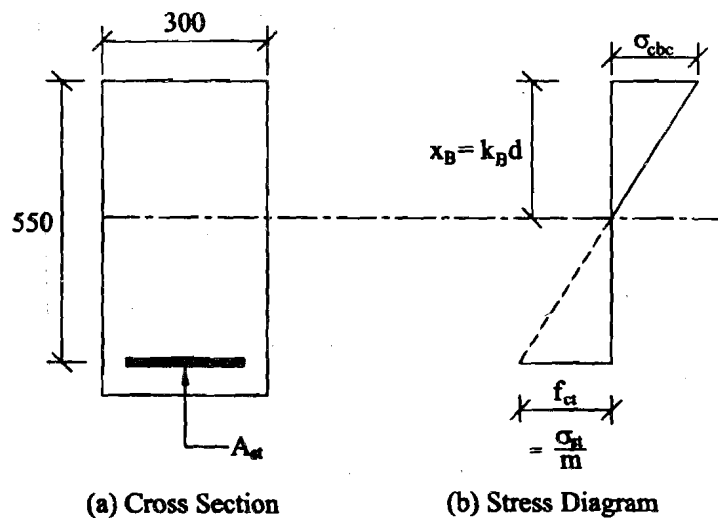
Showing Cross-Section and the Stress Diagram for Balanced Section
